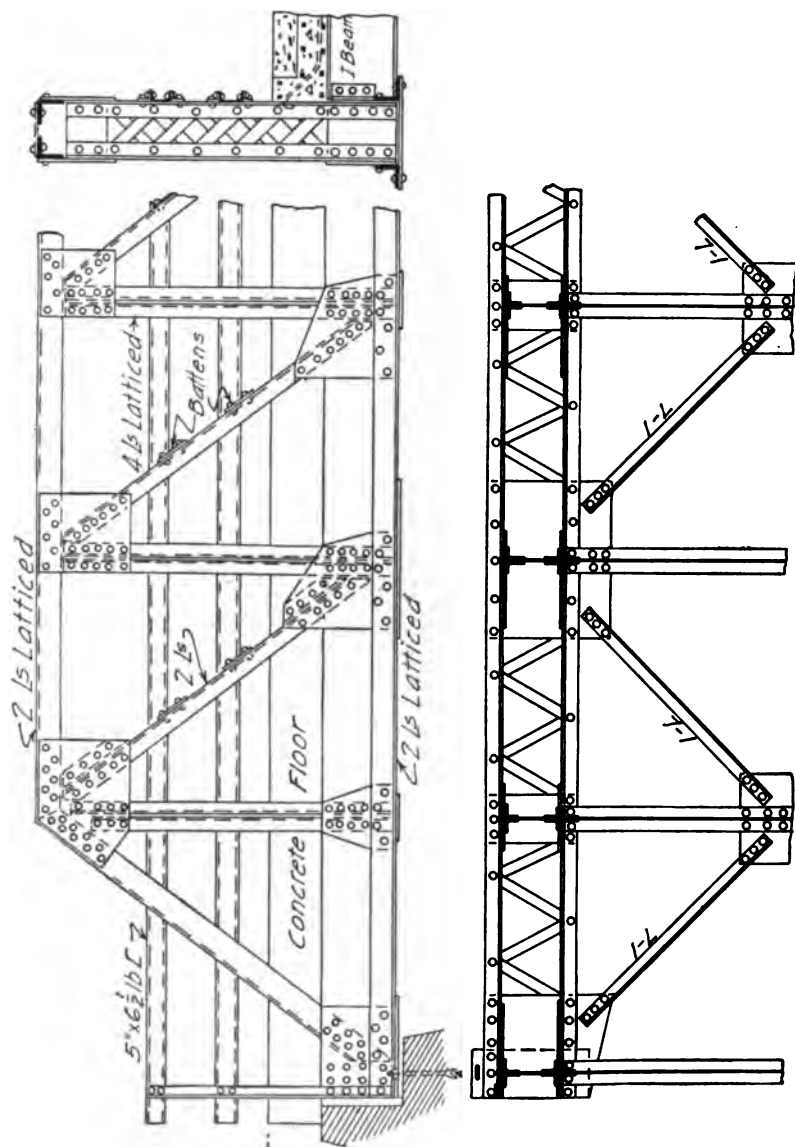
Riveted Pony Pratt Truss Bridge.
